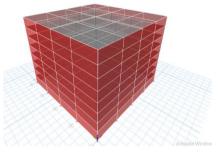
G +6 Building Frame with Full RCC Shear wall on Outer Peripheral Wall
